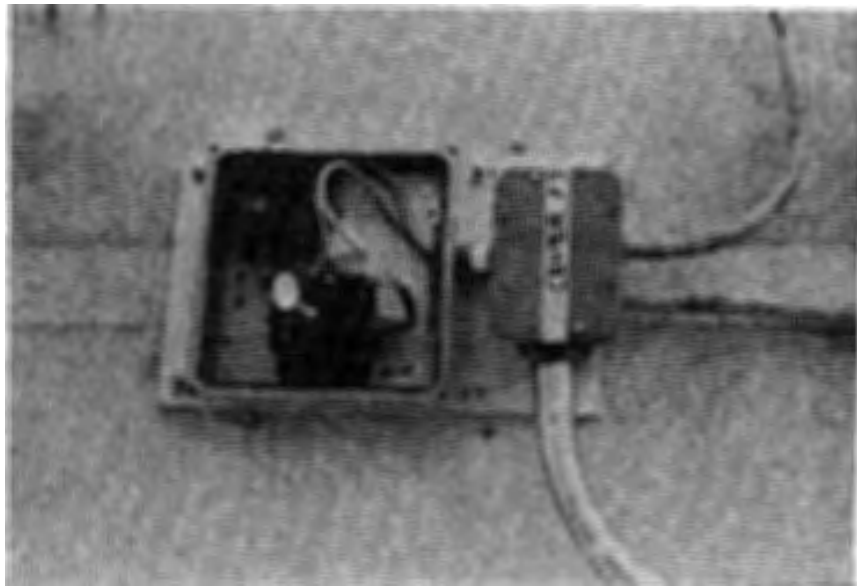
Remote accelerometer (FBA-1) anchored to underside of bridge deck.
